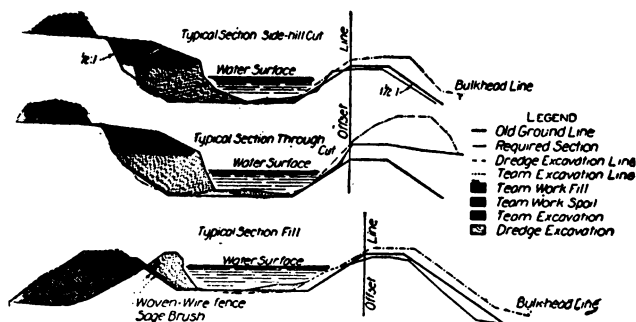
Typical Sections Excavated by Elevator Dredge.
